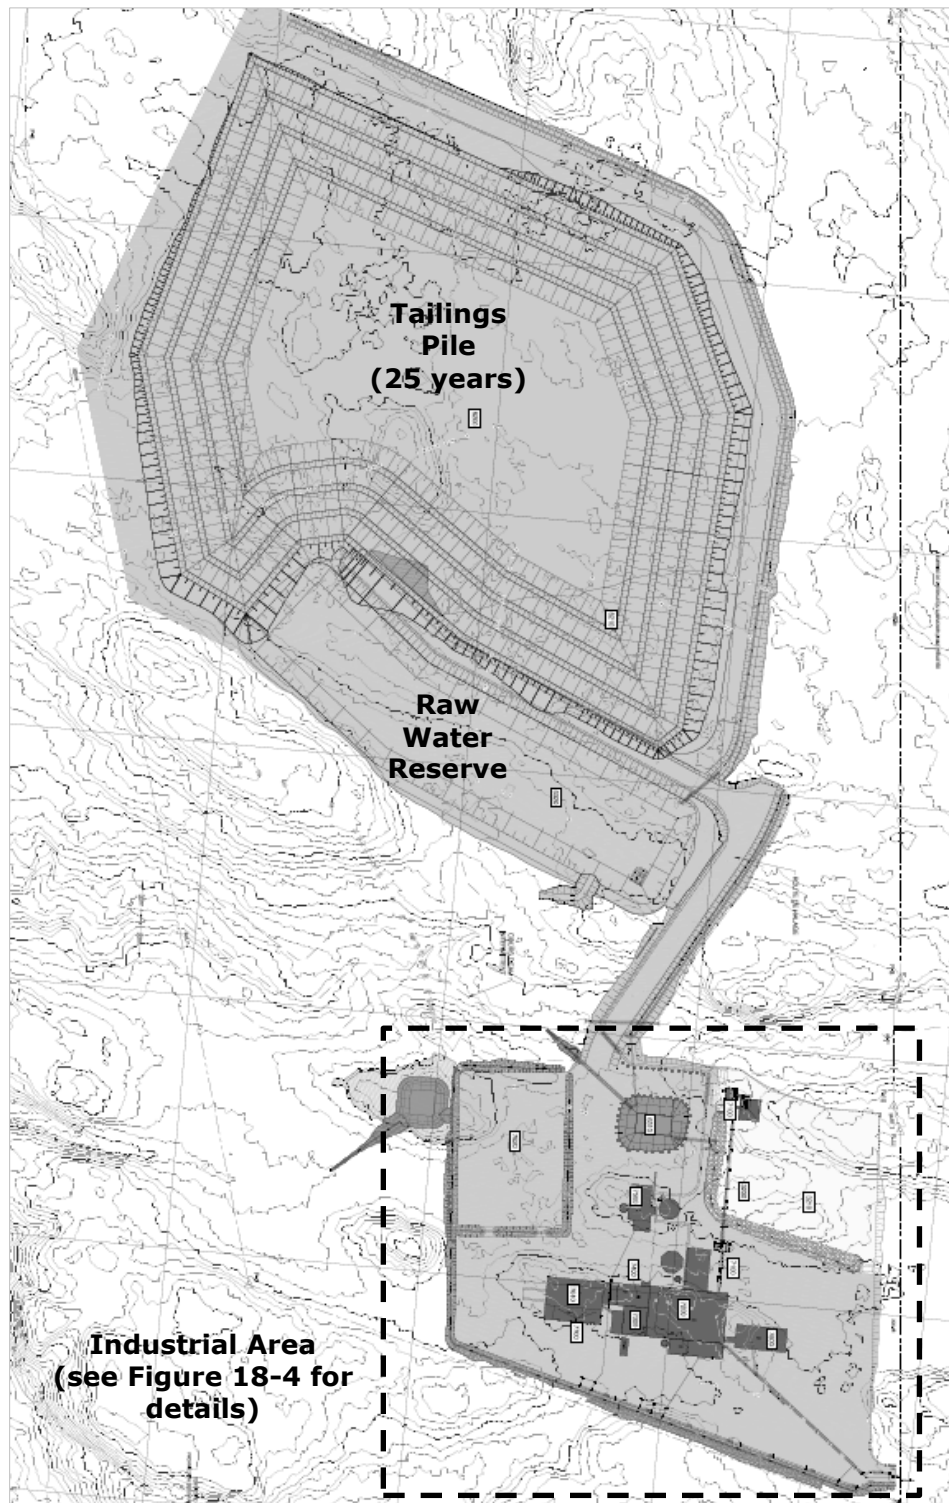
Baie-Comeau Site Plot Plan - General
